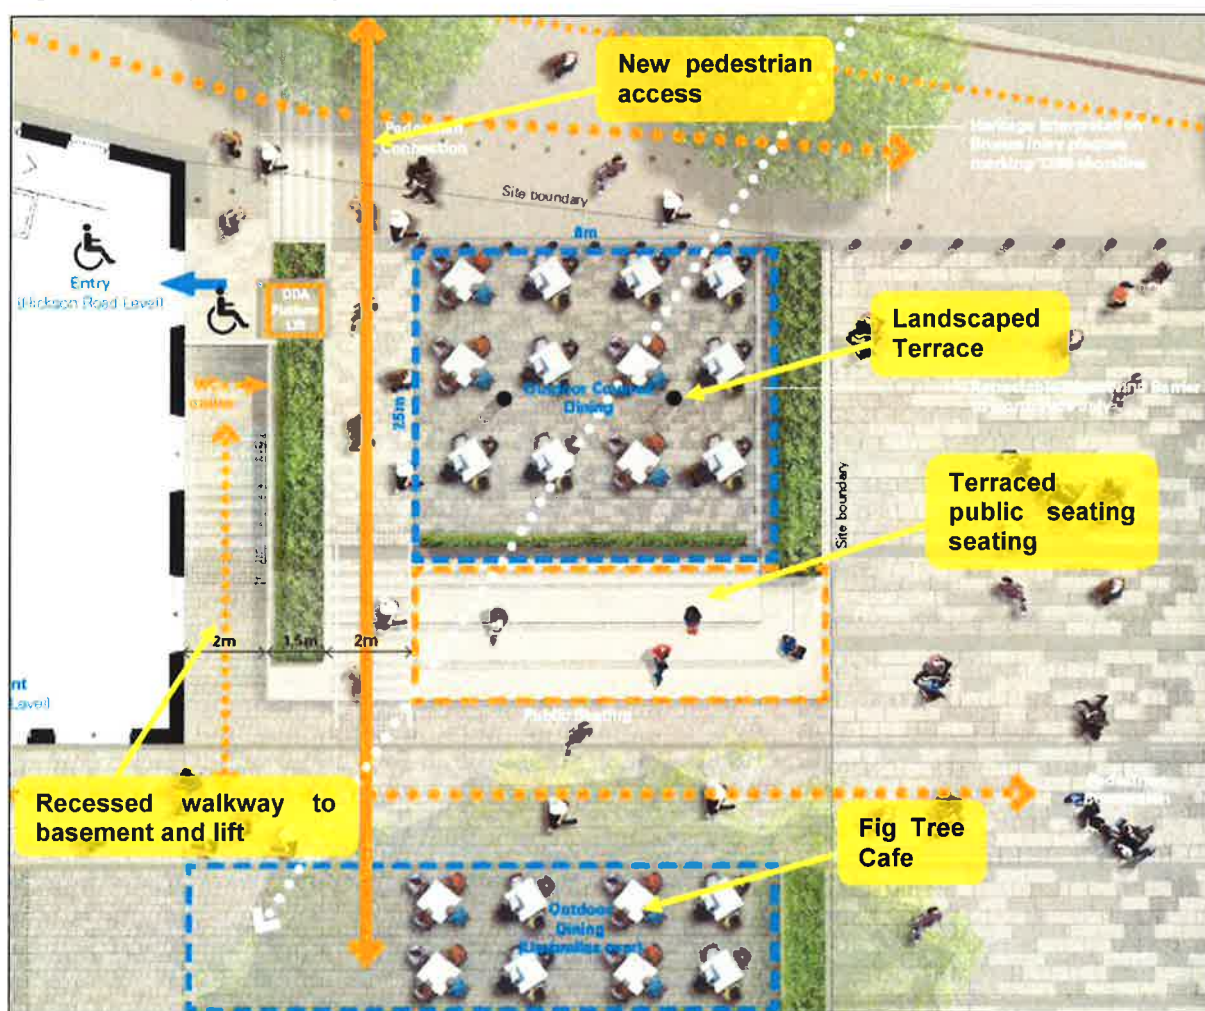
The proposed landscaped terrace and outdoor seating (Source: Applicant's RtS).
